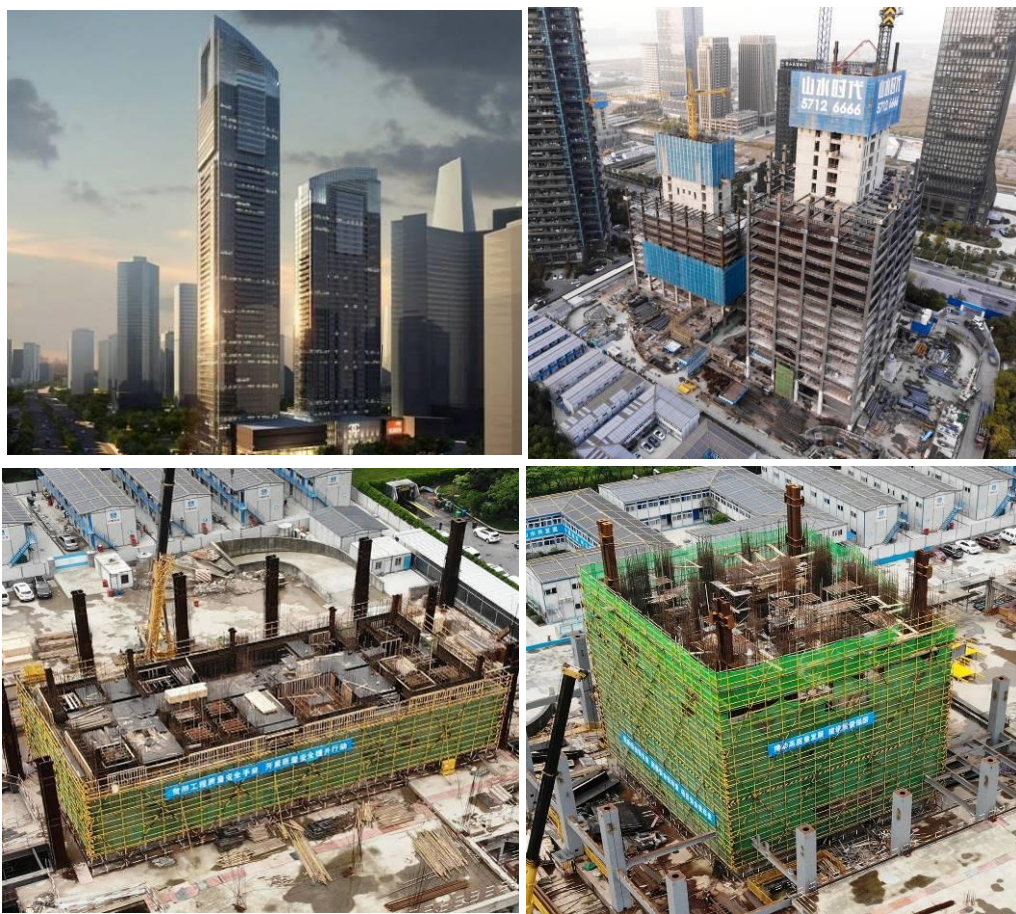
Hangzhou Longda Towers [86] [88]
